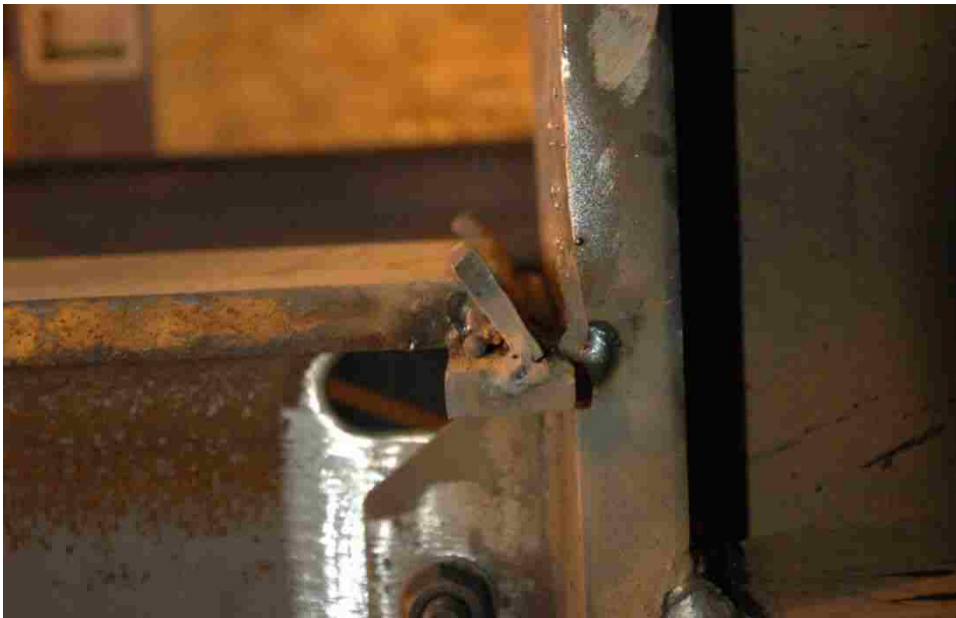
Ground Floor Beam Bottom Flange with Runoff Tabs in Place Prior to Welding
